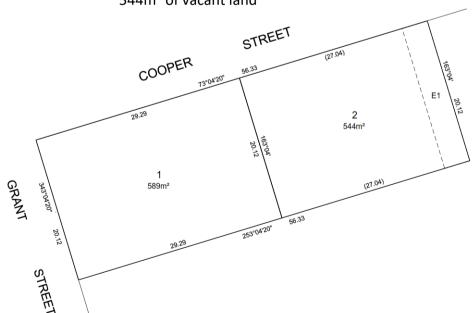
Proposed Plan of Subdivision. Source: Stacey Surveying
